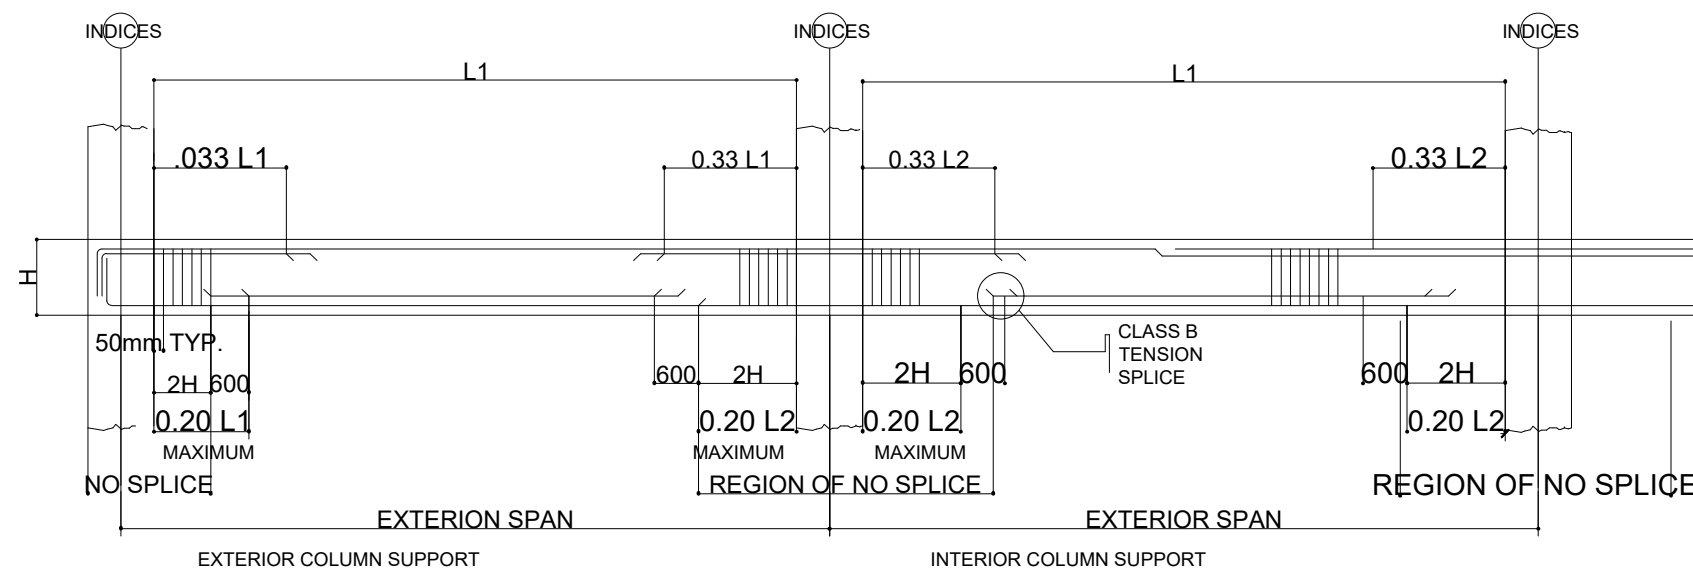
TYPICAL BAR DETAILS FOR PRISMATIC GIRDERS
